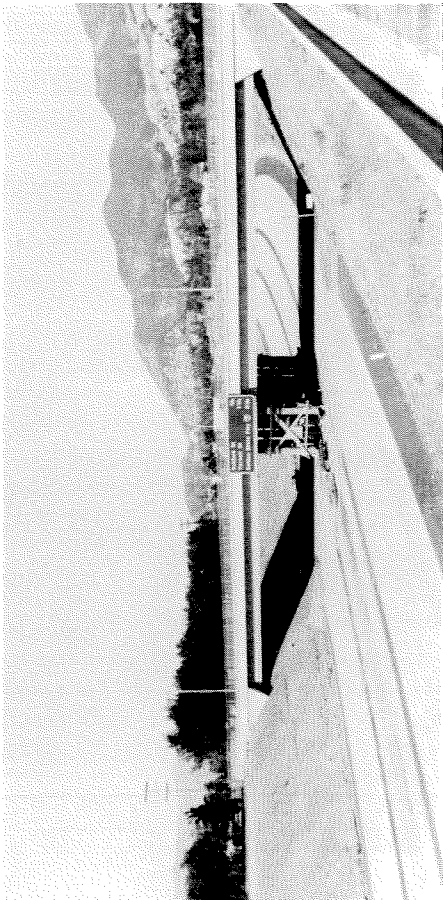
Bledsoe Street overpass, Foothill freeway.
